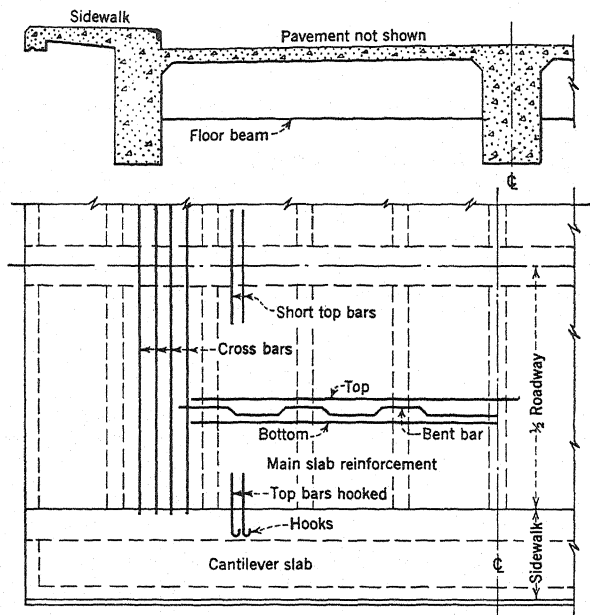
Bridge Floor Design: Girders, Floor Beams, and Slabs. (See p. 72.)
